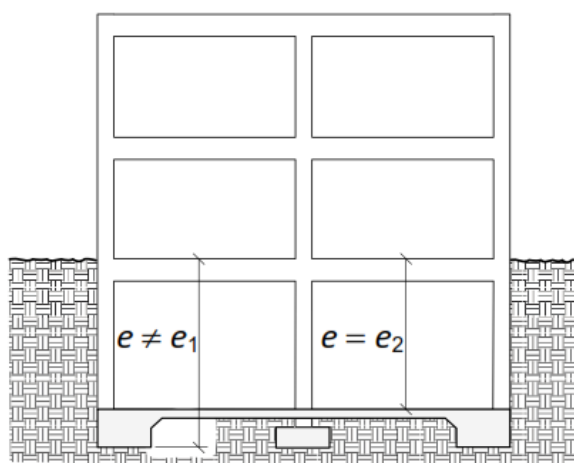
Depth of embedment for a building with a basement on perimeter strip footings and interior spread footings.
